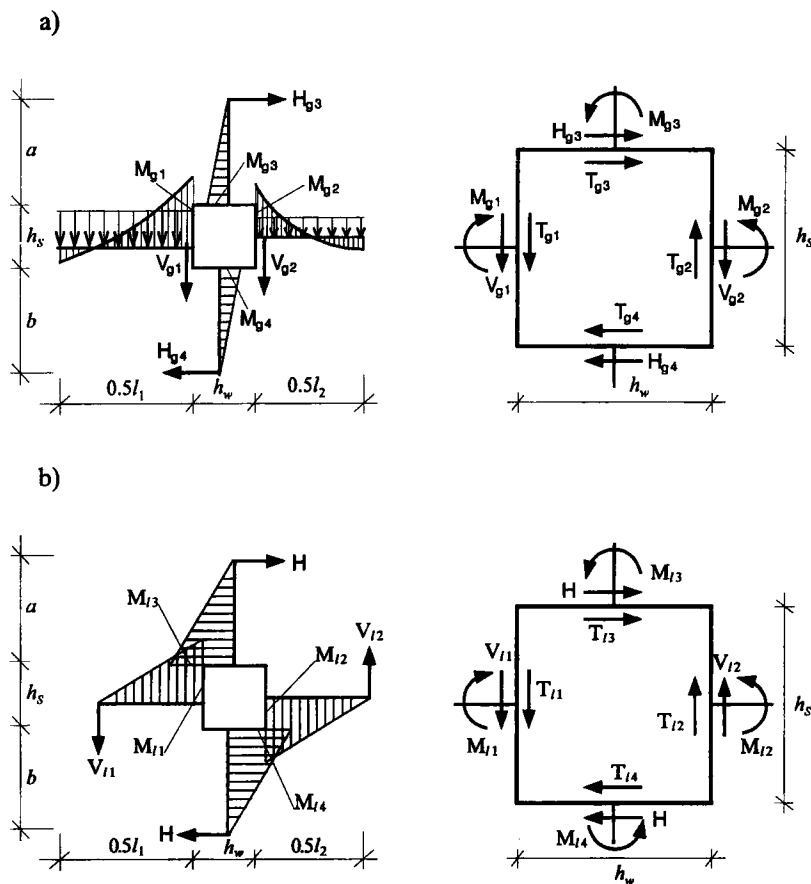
Acting bending moments and shear forces in slabs, walls and their joint core caused by gravity (a) and lateral (b) loads
